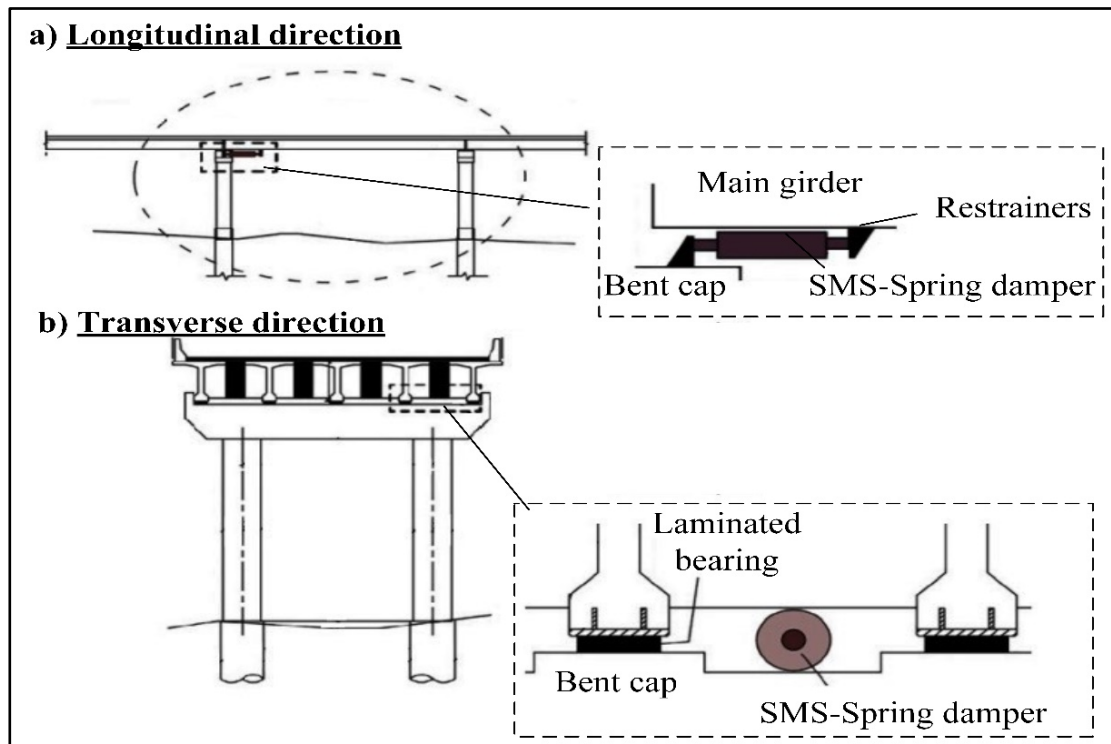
Location of the isolation system and dampers in an isolated bridge,
